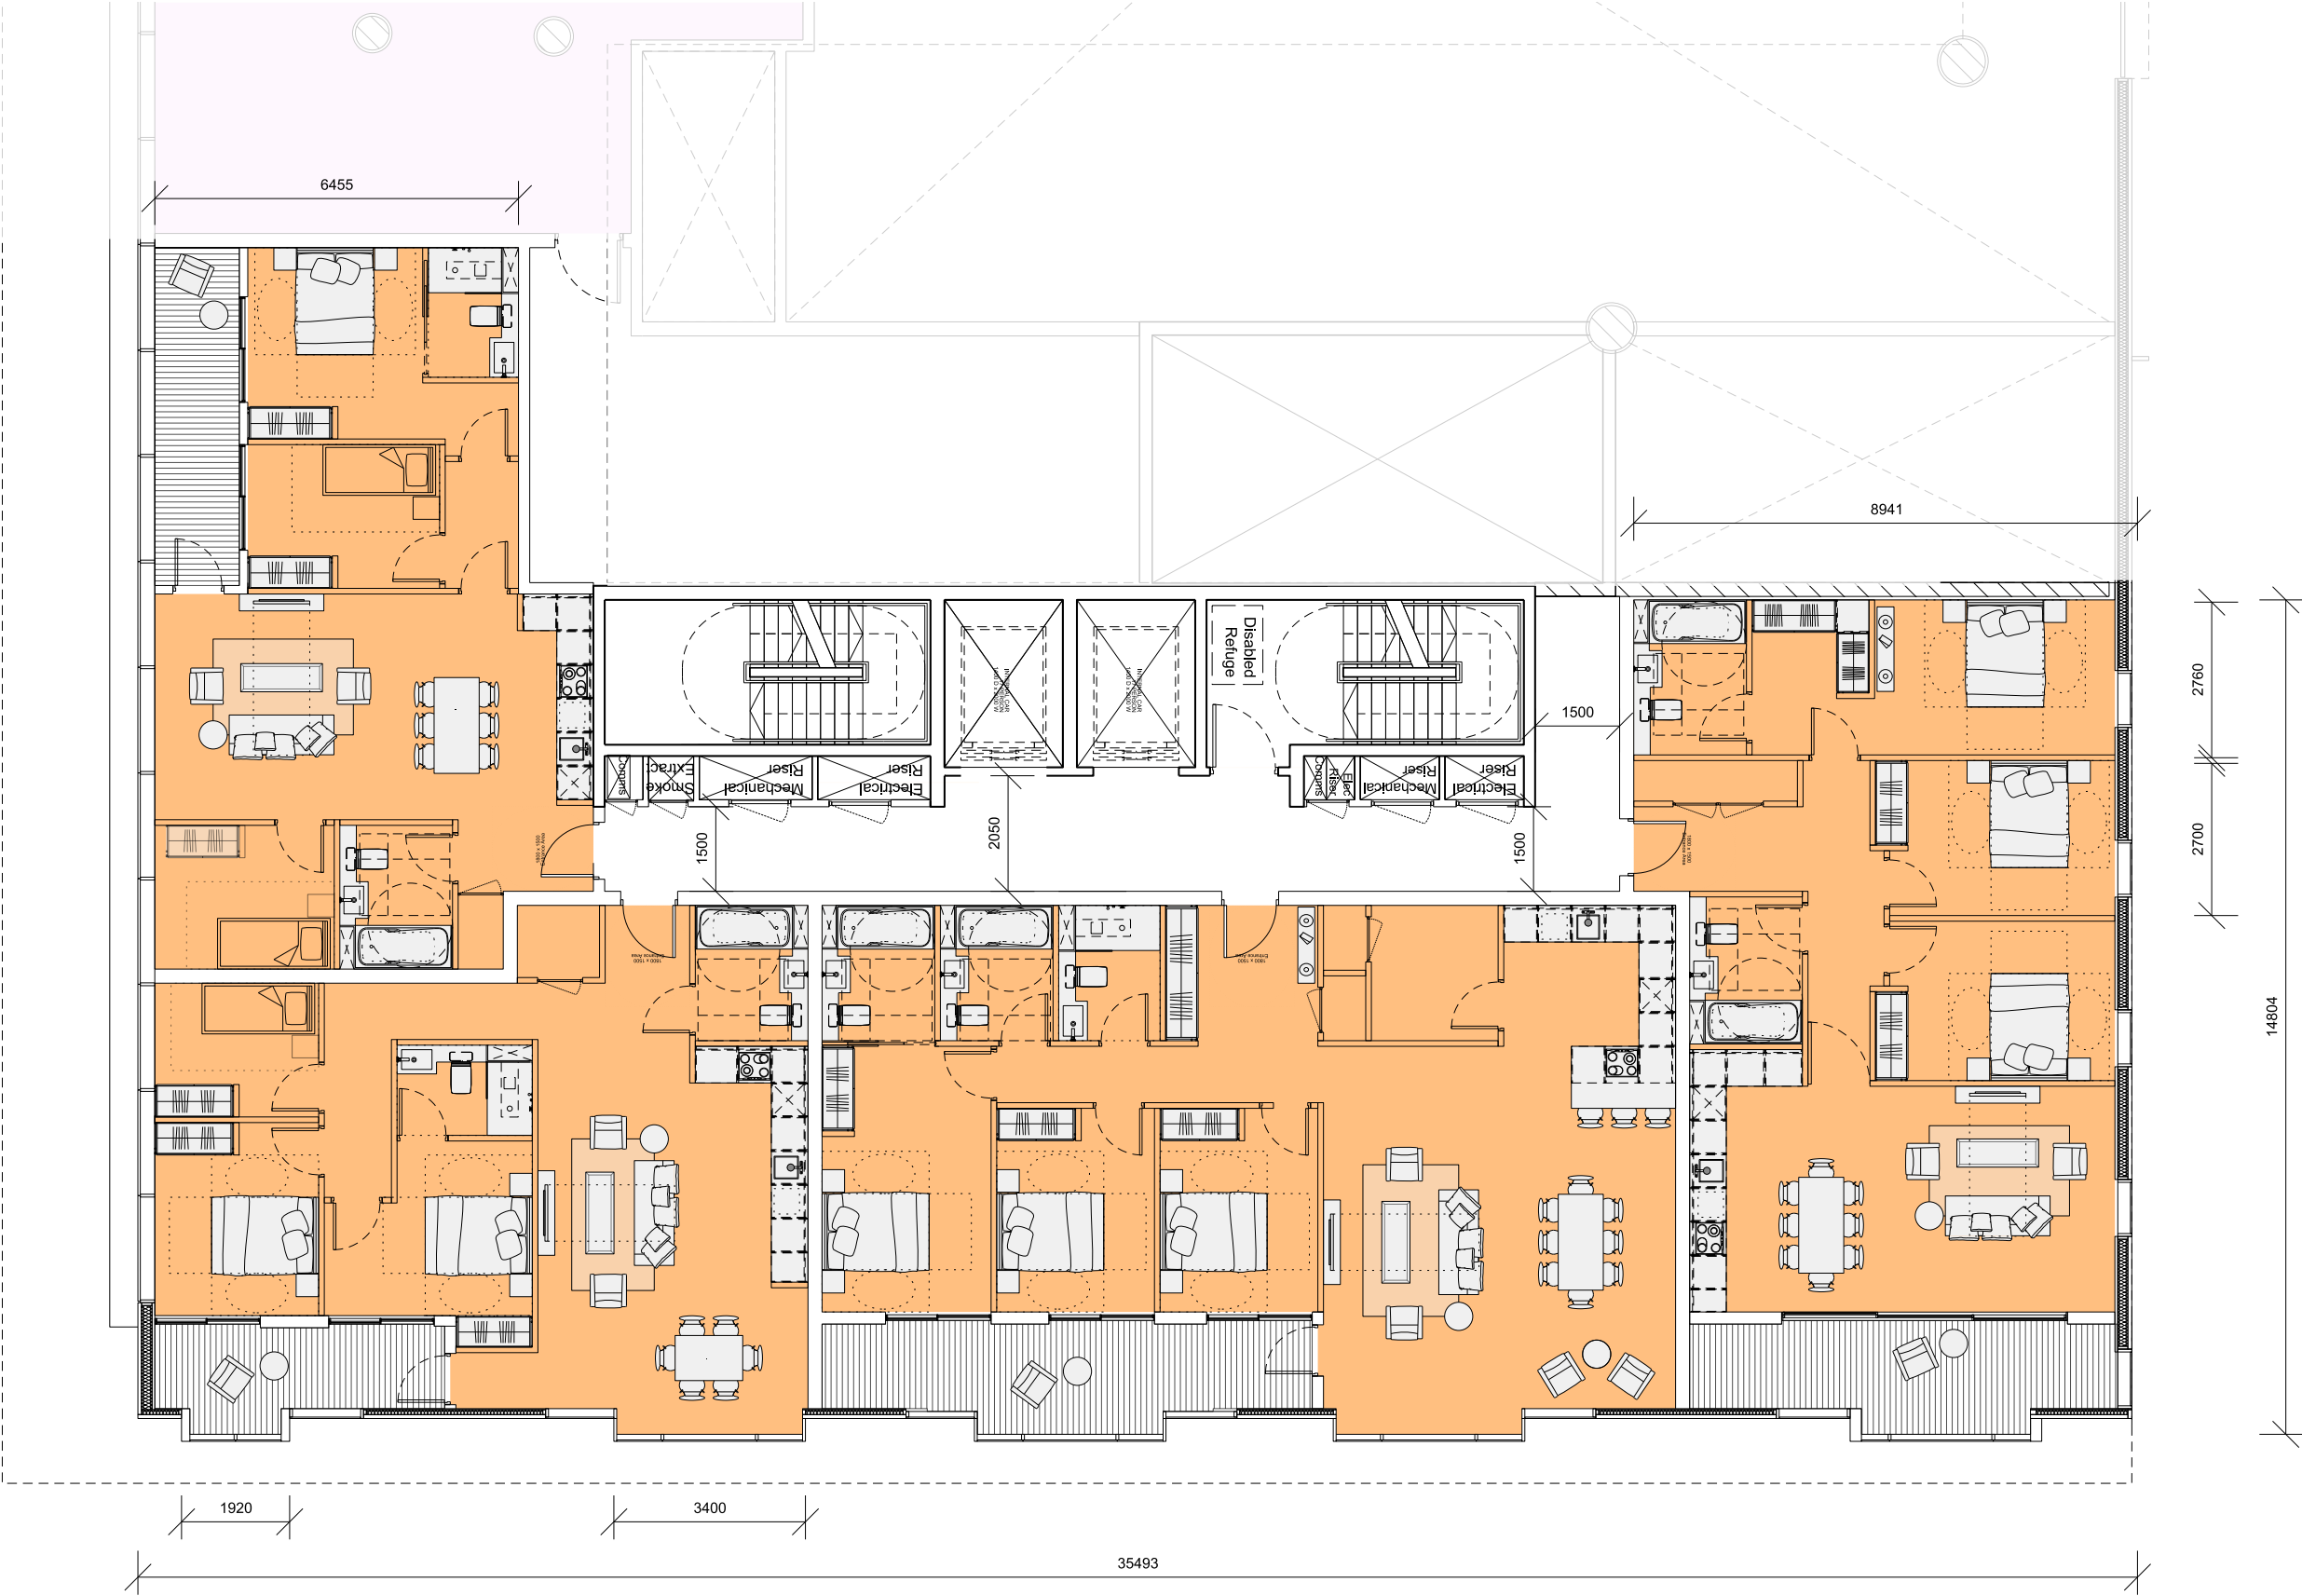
Mezzanine level floor plan of the residential component of the building
